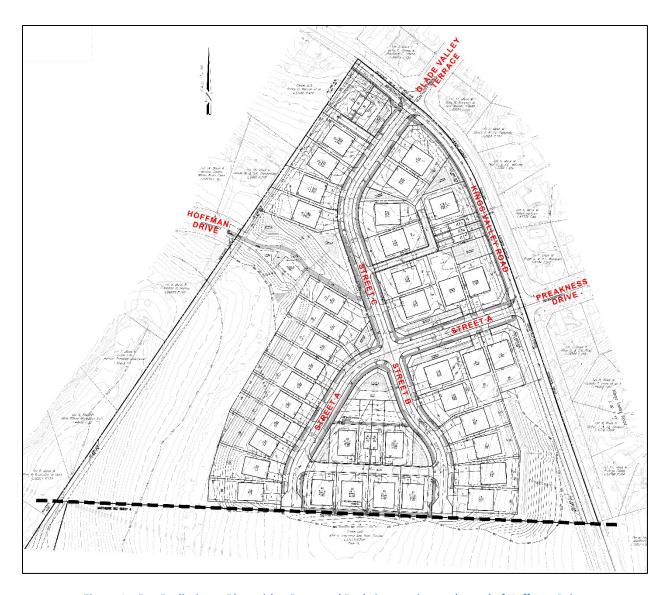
Pre-Preliminary Plan with a Proposed Path Connection at the end of Hoffman Drive
